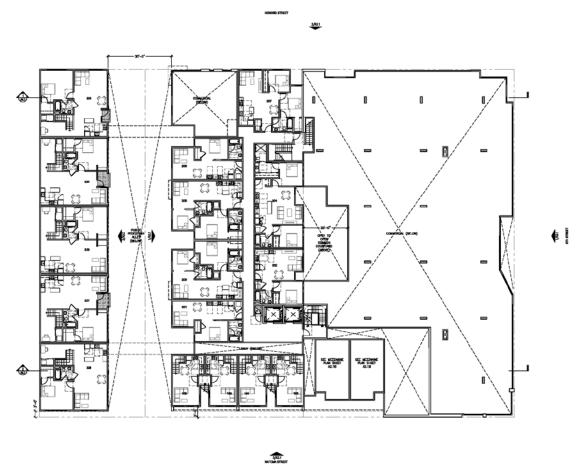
Floor Plan, Floor 1.5 (Natoma Street Driveway Option)
